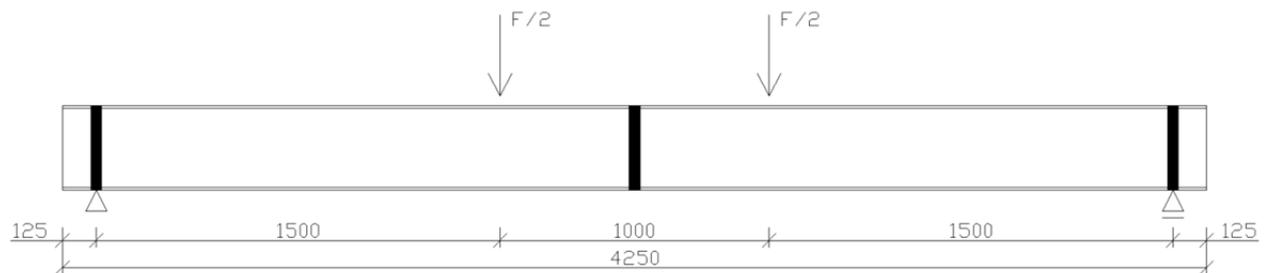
Four-point bending test set-up of the of hybrid steel-glass beams with SikaFast-5211.
